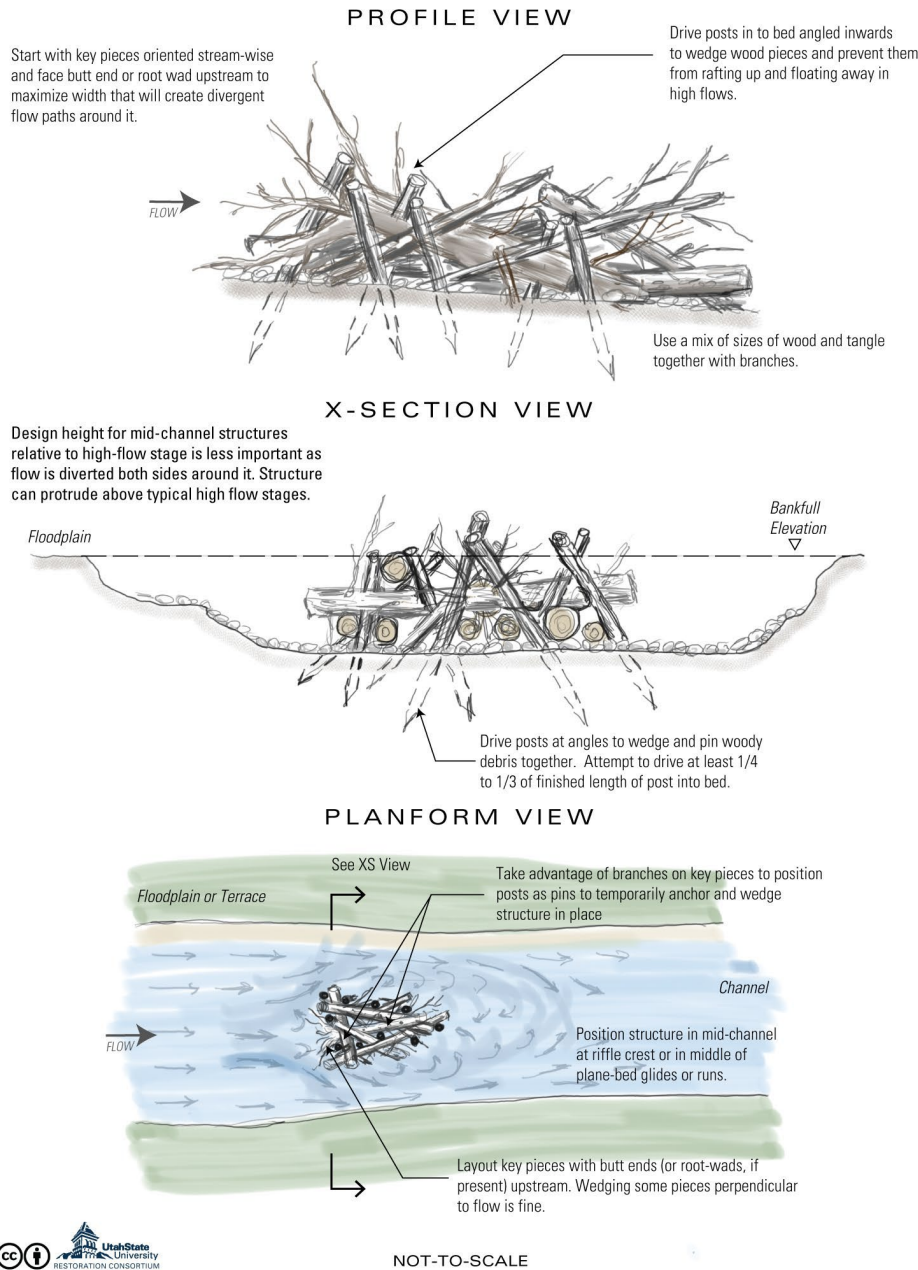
Example cross section and overhead view of typical post-assisted log structure.
